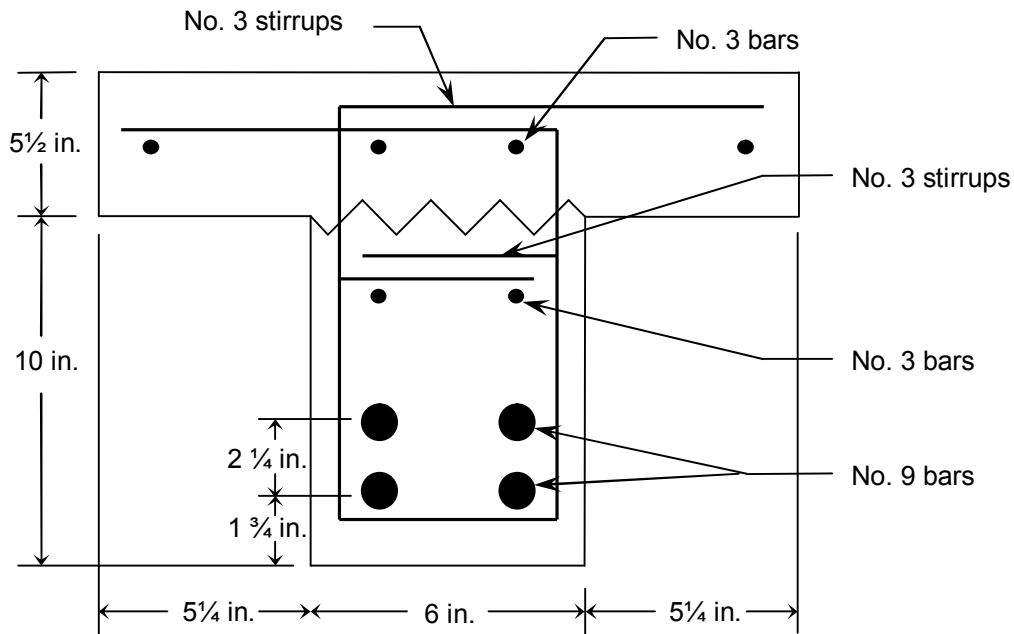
Typical T-beam cross section. Note: 1 in. = 25.4 mm; No. 3 bar = 10 M; No. 9 bar = 29 M.
